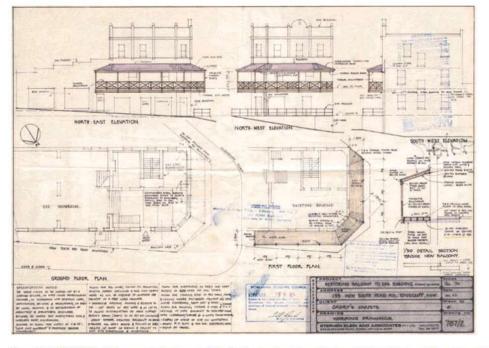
BA1985/218 which approved reinstatement of the first floor level cantilevered balcony. Architect: Stephen Klein and Associates. These works were not carried out. (Source: Woollahra Council)
